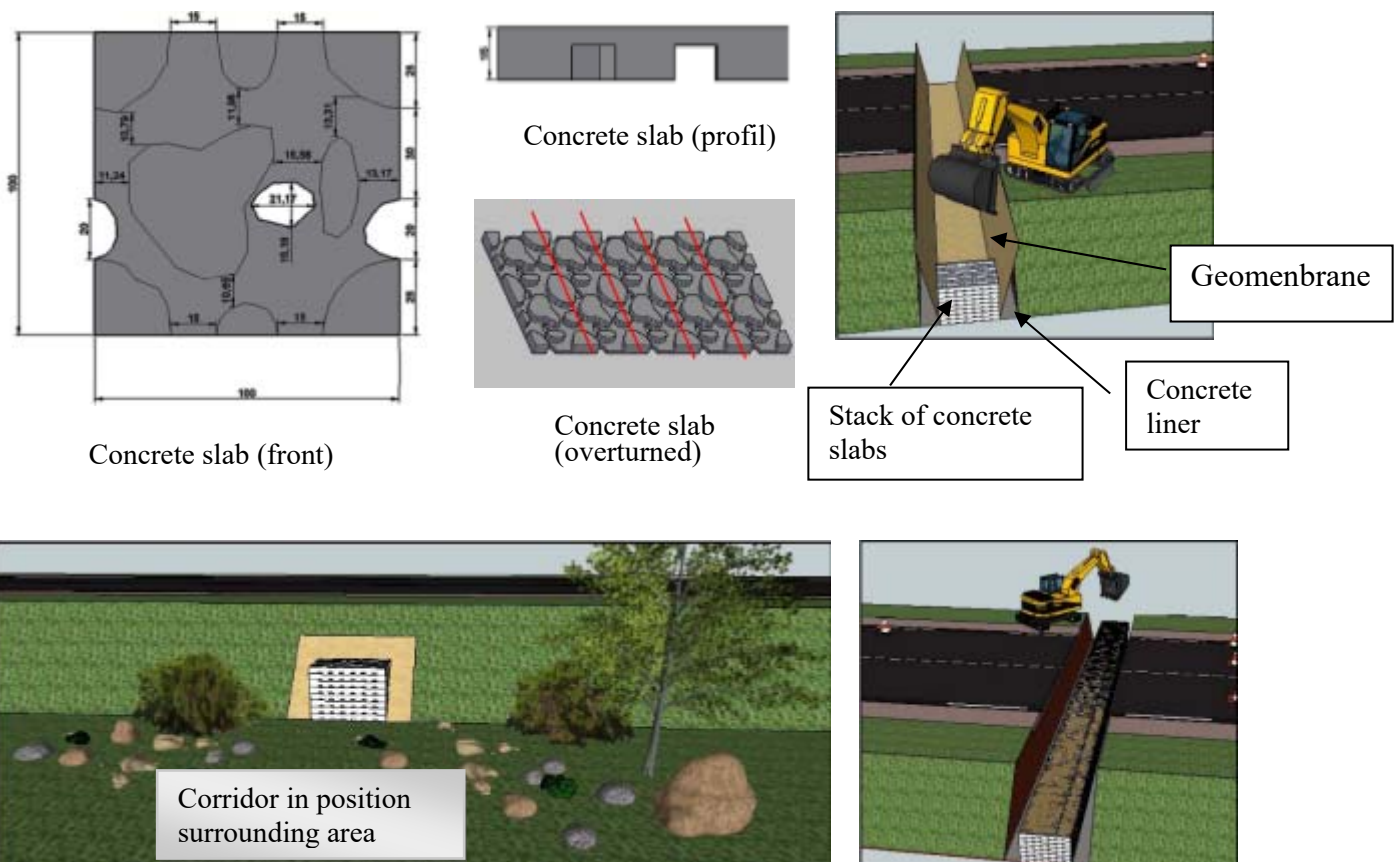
Diagrams and cross-sections of a crossing specifically for reptiles and the molded reinforced concrete slabs used to build it (E. Doucet, C. Rey, I. Sbai, S. Tari, P. Feraud, A. Le Bihan, T. Thomas and R. Mordome, Joseph Fourier University)
